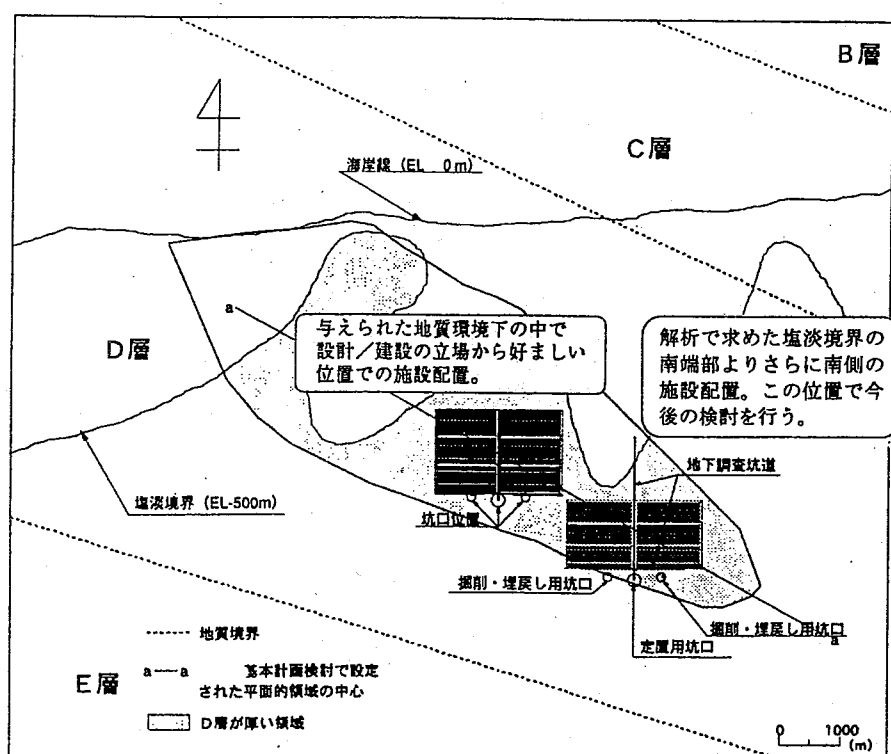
Basic plan of facility layout in area of sedimentary rock Formation (conceptual design)
